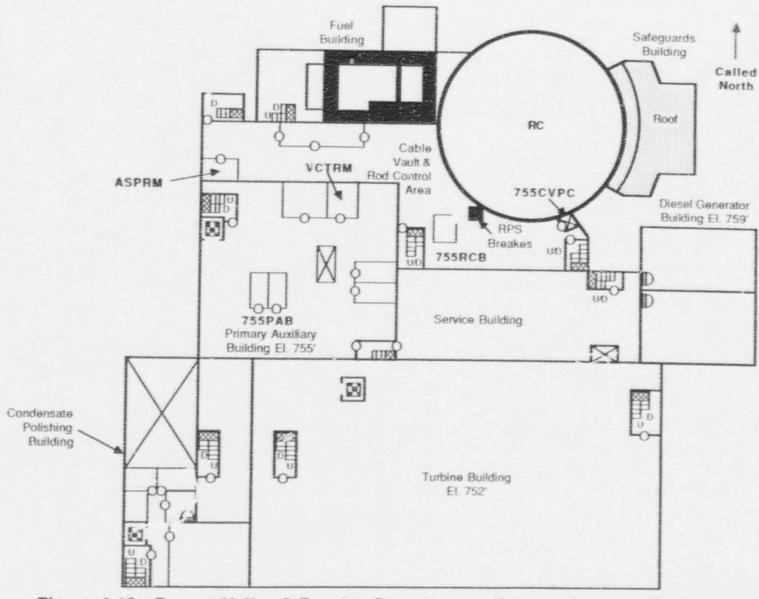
Beaver Valley 2 Reactor Containment, Primary Auxiliary Building, Diesel Generator Building, Safeguards Building, Rod Control Building, Fuel Building, and Turbine Building (Elevation 755'6")
